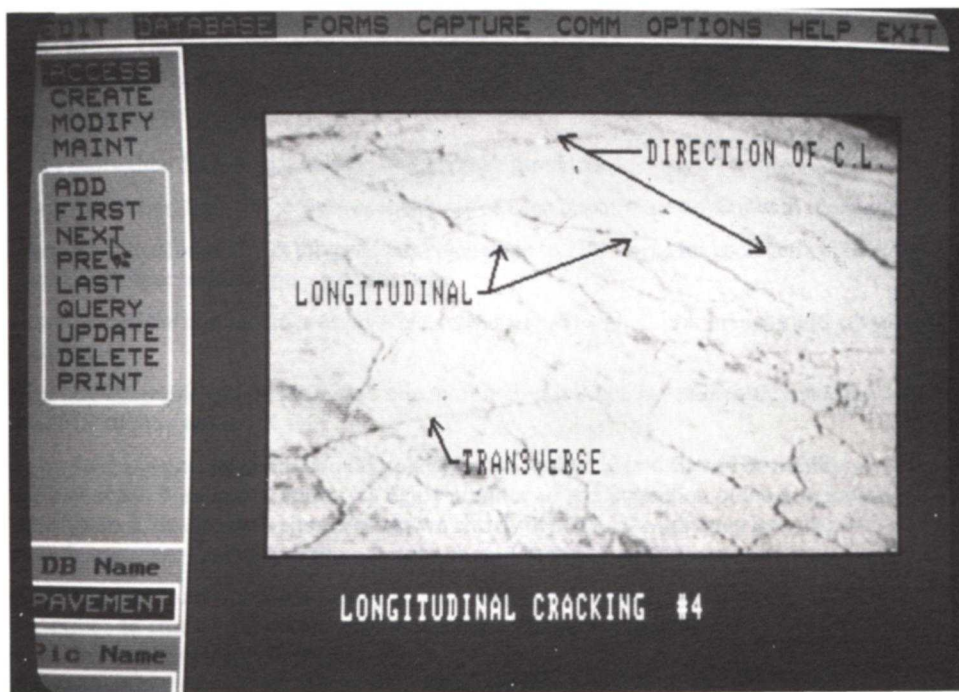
Video still-frame placed in the IDB showing longitudinal cracking.
